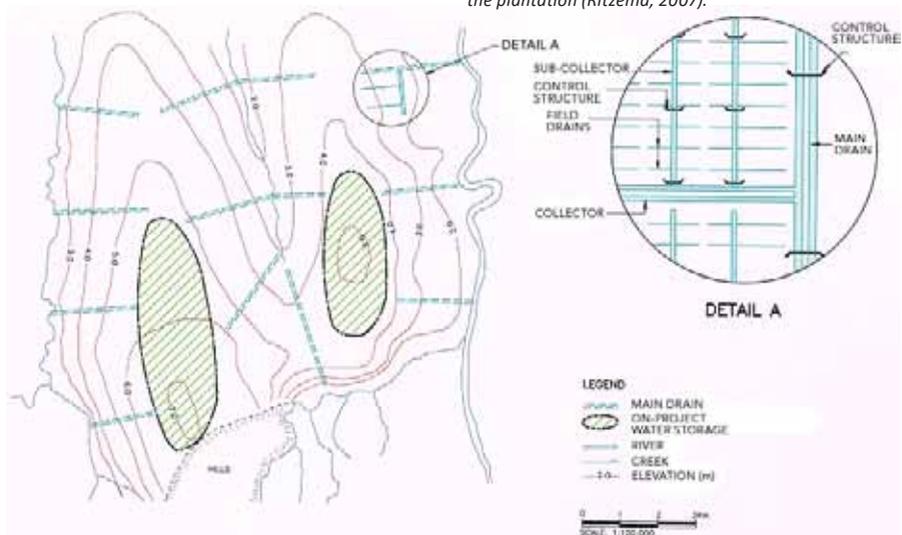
Typical layout of a drainage system on the lower slopes of a peat dome which contributes water to the plantation (Ritzema, 2007).
